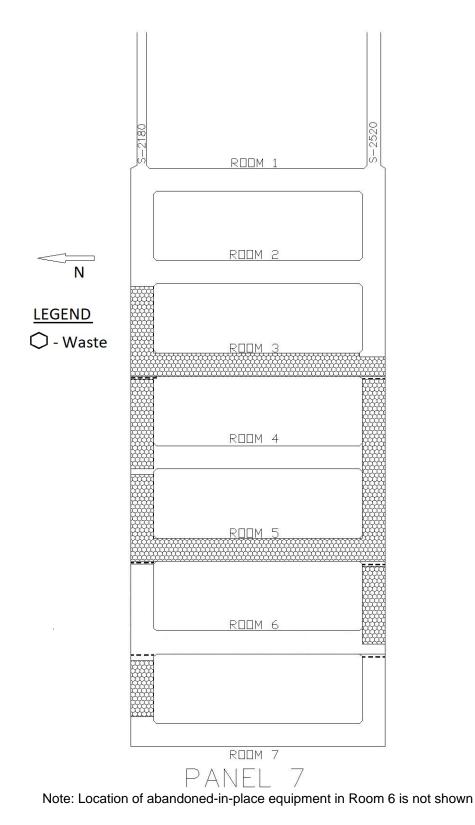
Panel 7 Showing Waste Emplacement and Abandoned Rooms (as of 3/1/2020)
